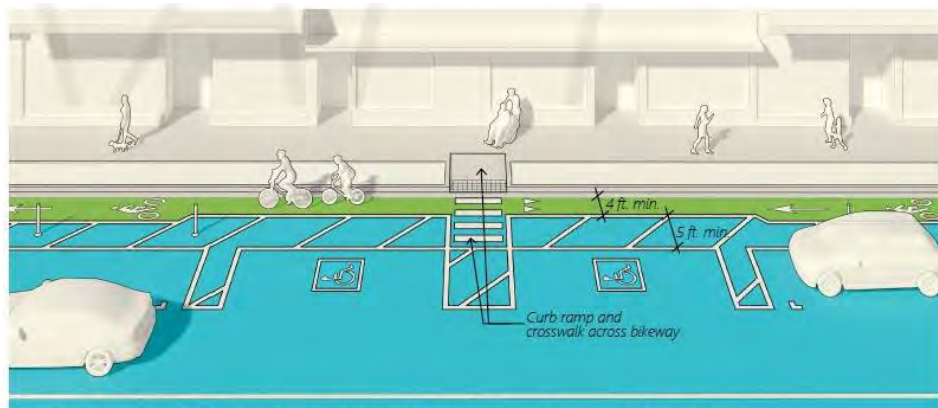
On-street class IV bikeway at accessible on-street parking with required clearances and paths of travel.
